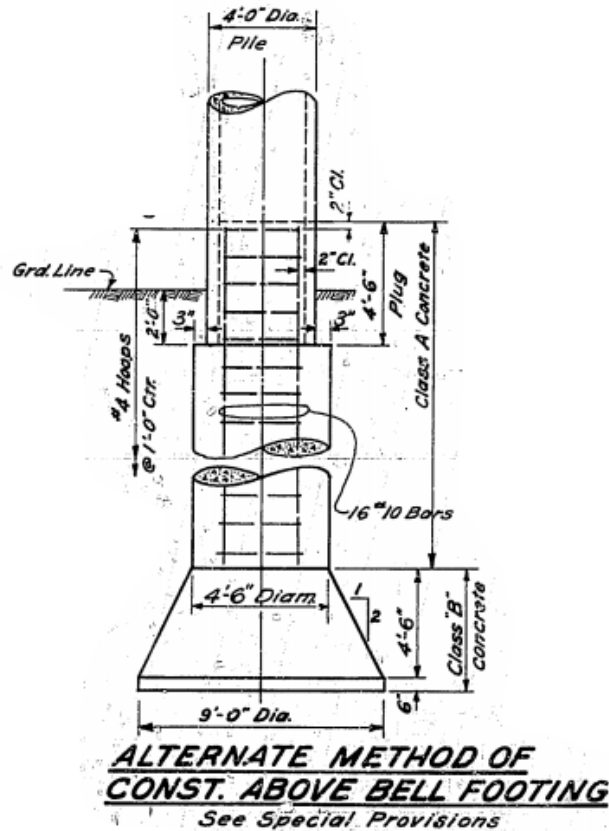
Alternative Method of Pile Construction for East Galer St. Bridge
